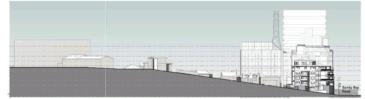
Sandy Bay Road elevation detailing existing and proposed building forms, including the proposed building at 9 Sandy Bay Road for context (source: Scanlan Architects)
